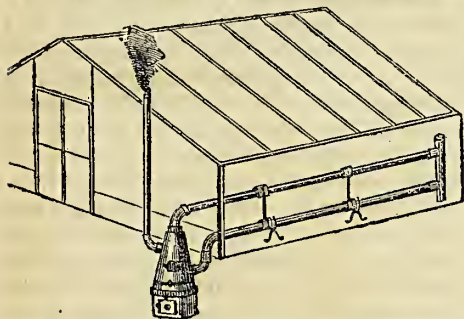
PLAN OF HEATING A GREEN-HOUSE.
